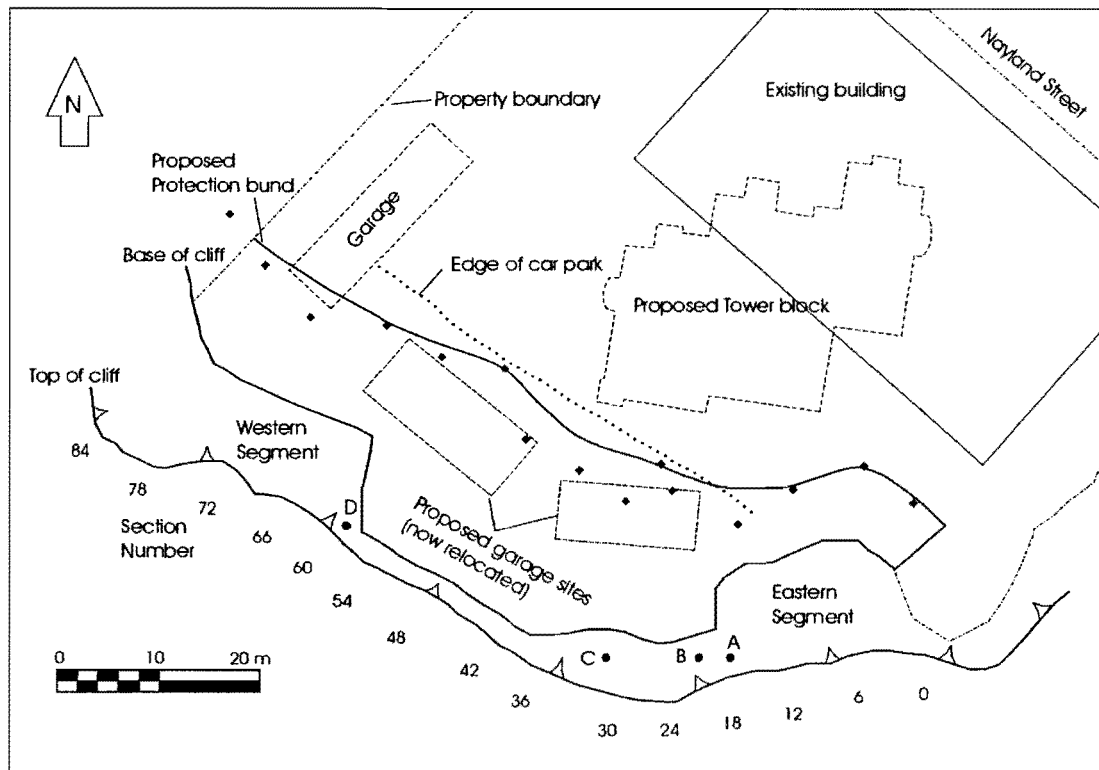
Site sketch plan of Marine apartments, Sumner (modified from Bell 1996)
